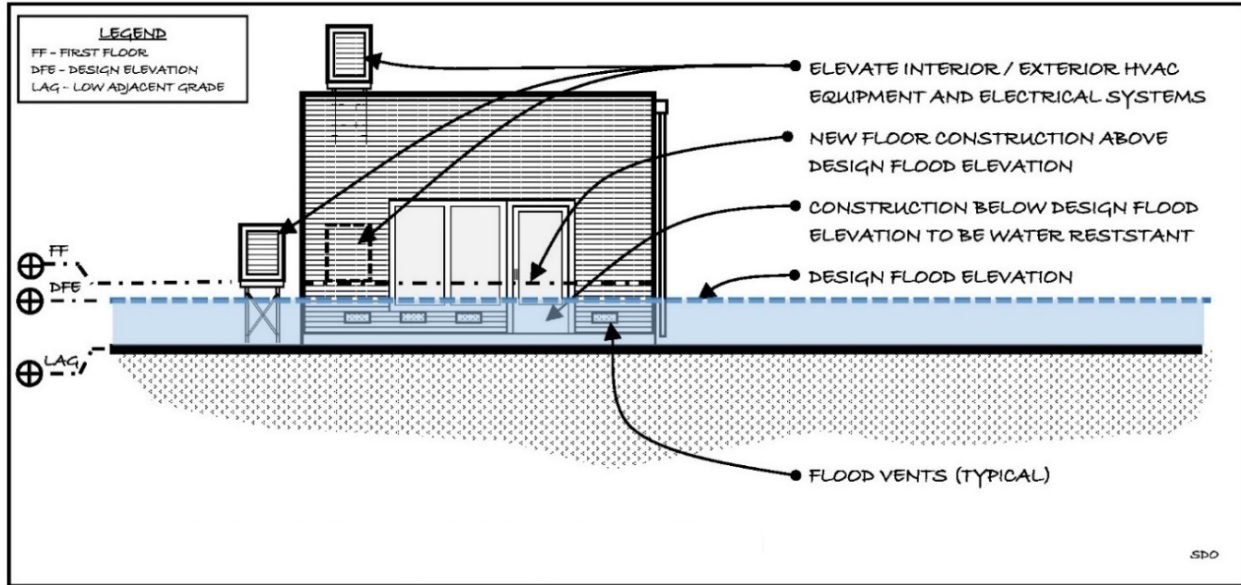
Diagram depicting first floor elevation. Diagram not to scale.
